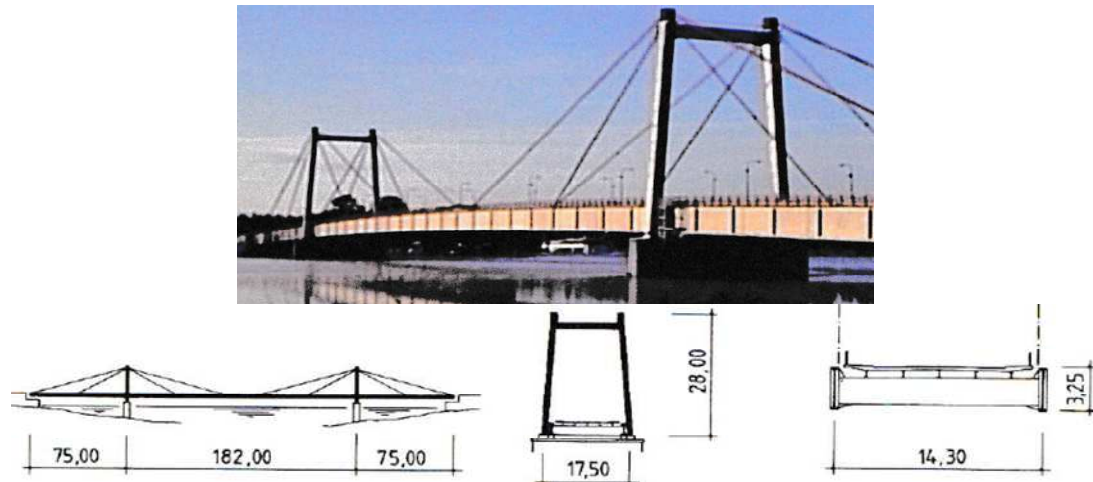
3: First modern cable-stayed bridge: Strömsund, 1956 (Wenk, 1954 and Ernst, 1956 apud Svensson, 2012).
